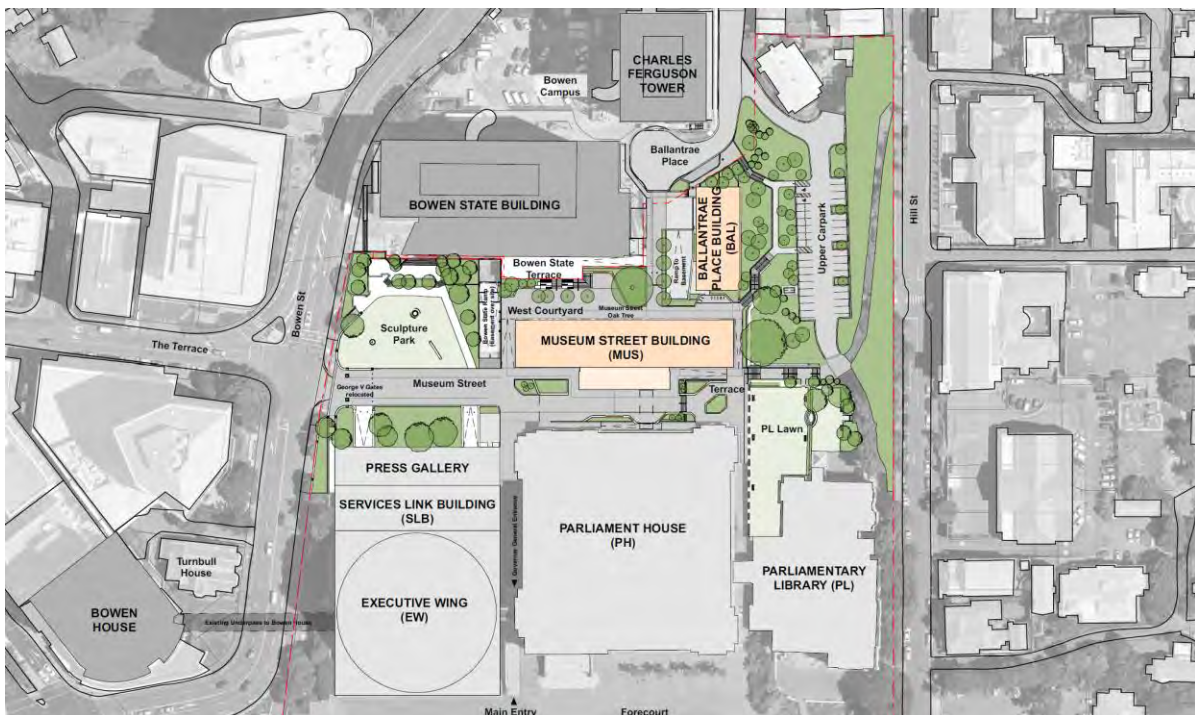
Proposed Site Plan - Location Plan, Layout I.D P A2-03, revision 2 prepared by Studio Pacific Architecture.
